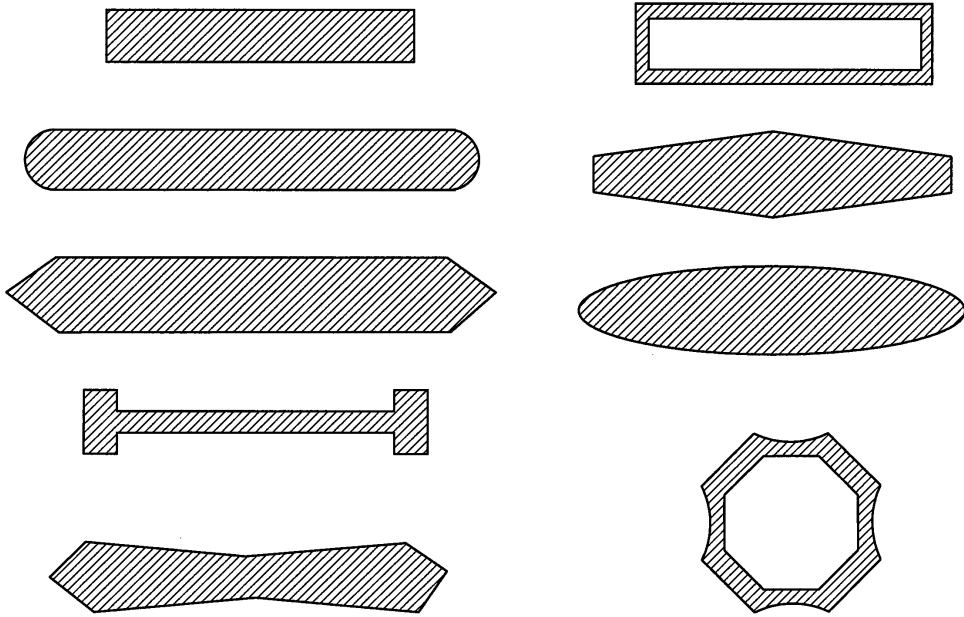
Typical cross-section shapes of piers for river and waterway crossings.
